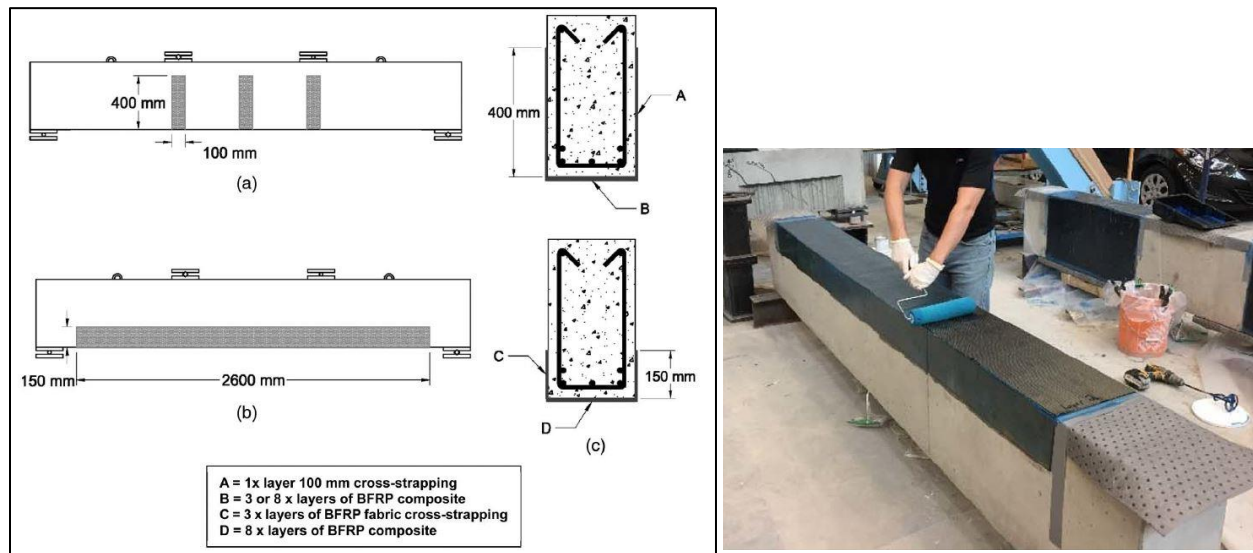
Left: BFRP reinforcement configurations (a) midspan scheme; (b) bottom scheme; (c) sections. Right: Installation of BFRP Sheets for the bottom cross-strapping scheme. (Duic et al. 2018)
